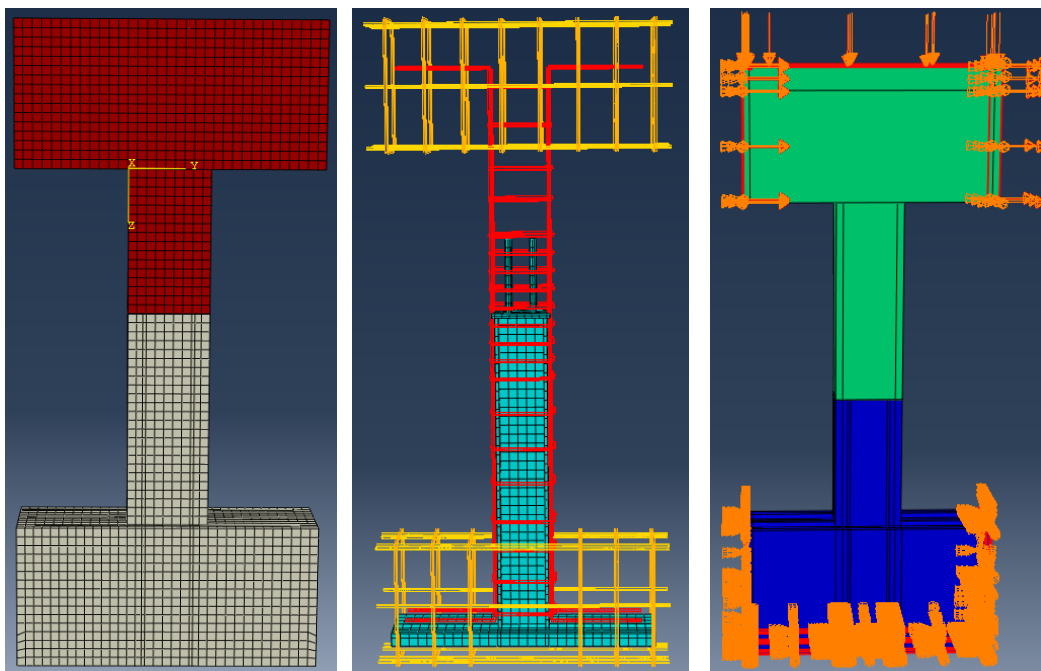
Hybrid Specimen Geometry (left), Reinforcement and structural steel arrangement (center) & boundary conditions (right)
